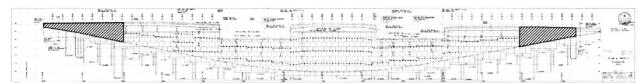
Composite sketch of project area. Shaded areas indicate locations of cantilever drilled shaft wall.
